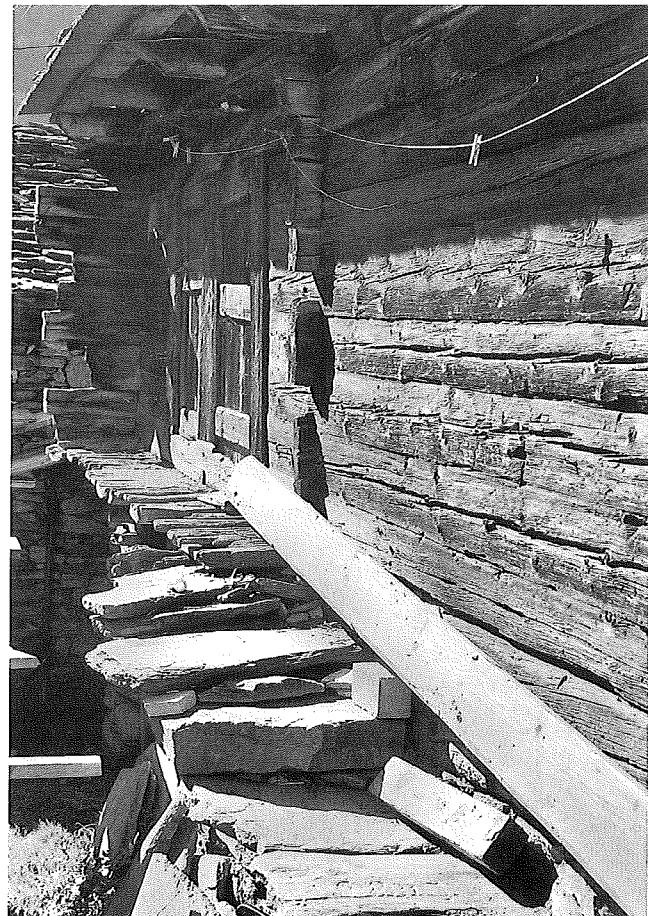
Access to granary via basement wall and protruding floor planks in a multipurpose farm house. Dandrio, Malvaglia (TI). Photo B. Furrer 2001.
